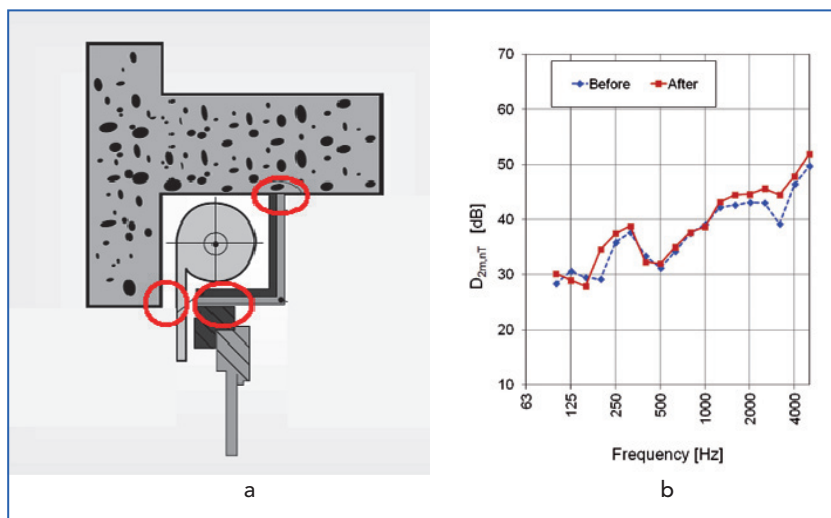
a) Leakages between shutter box, wall and window frame, b) Case study: façade insulation before and after sealing between shutter box and wall.
